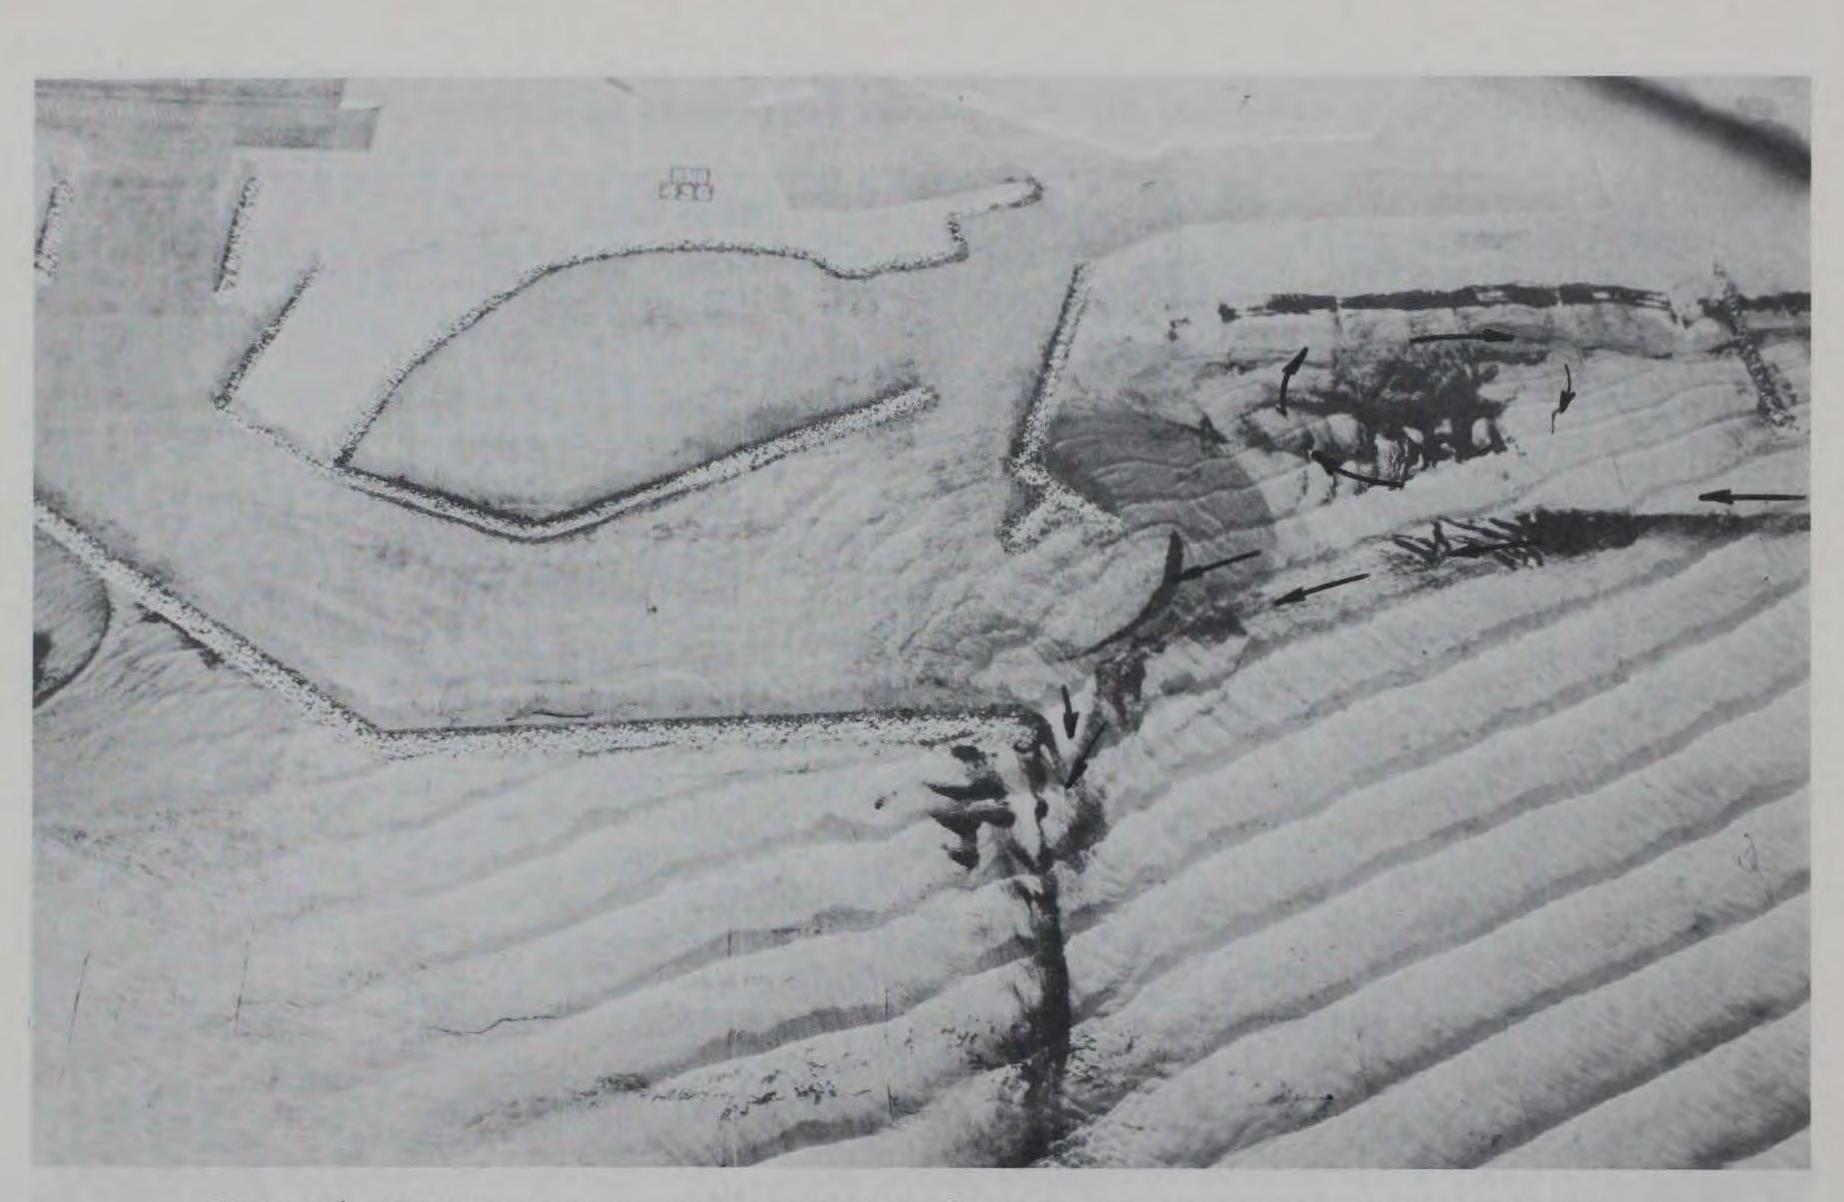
Typical tracer movement for Plan 62 resulting from 9-sec, 10-ft waves from south at mllw
